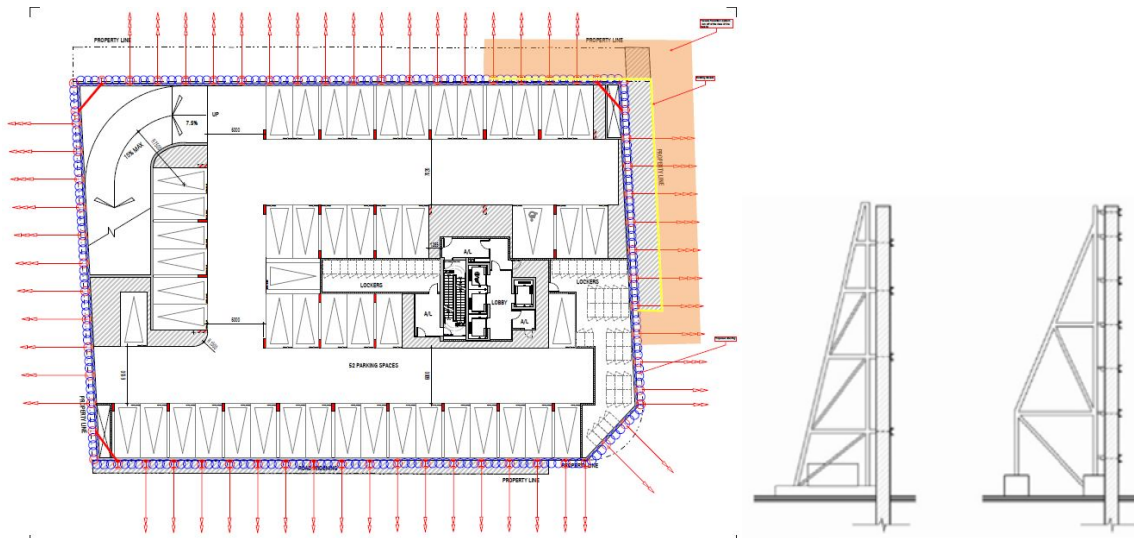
Facade Retention System approx. 4m off of the face of the façade shown on P4 Underground Floor Plan and conceptual façade bracing section by G+C Architects (Source: SG Constructors, HC Matcon Inc.)
